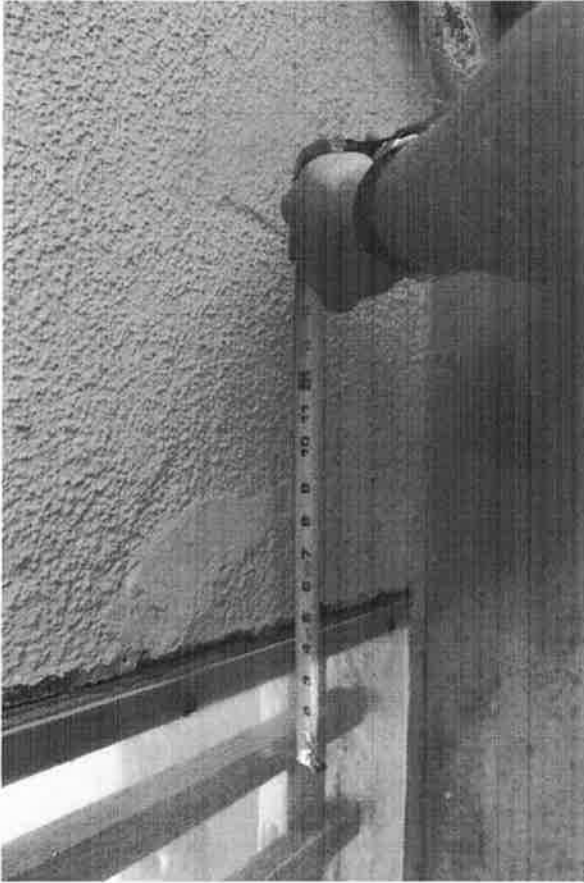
Isolated crack along previously repaired area of CMU wall (typical)
